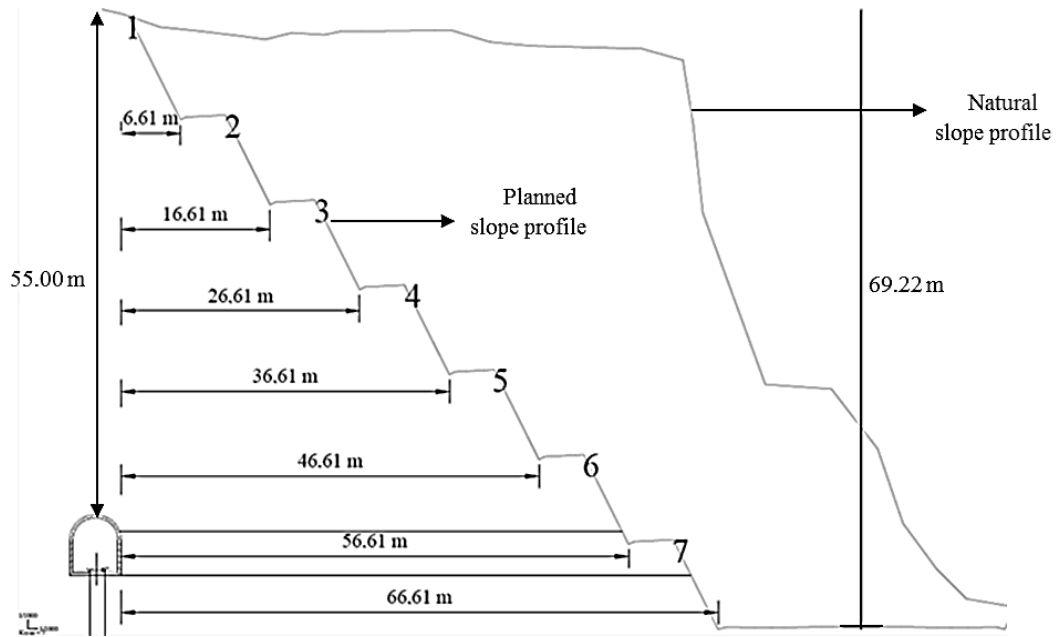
Cross-sectional view of the tunnel of the critical Km 26+640, section (A-A')
